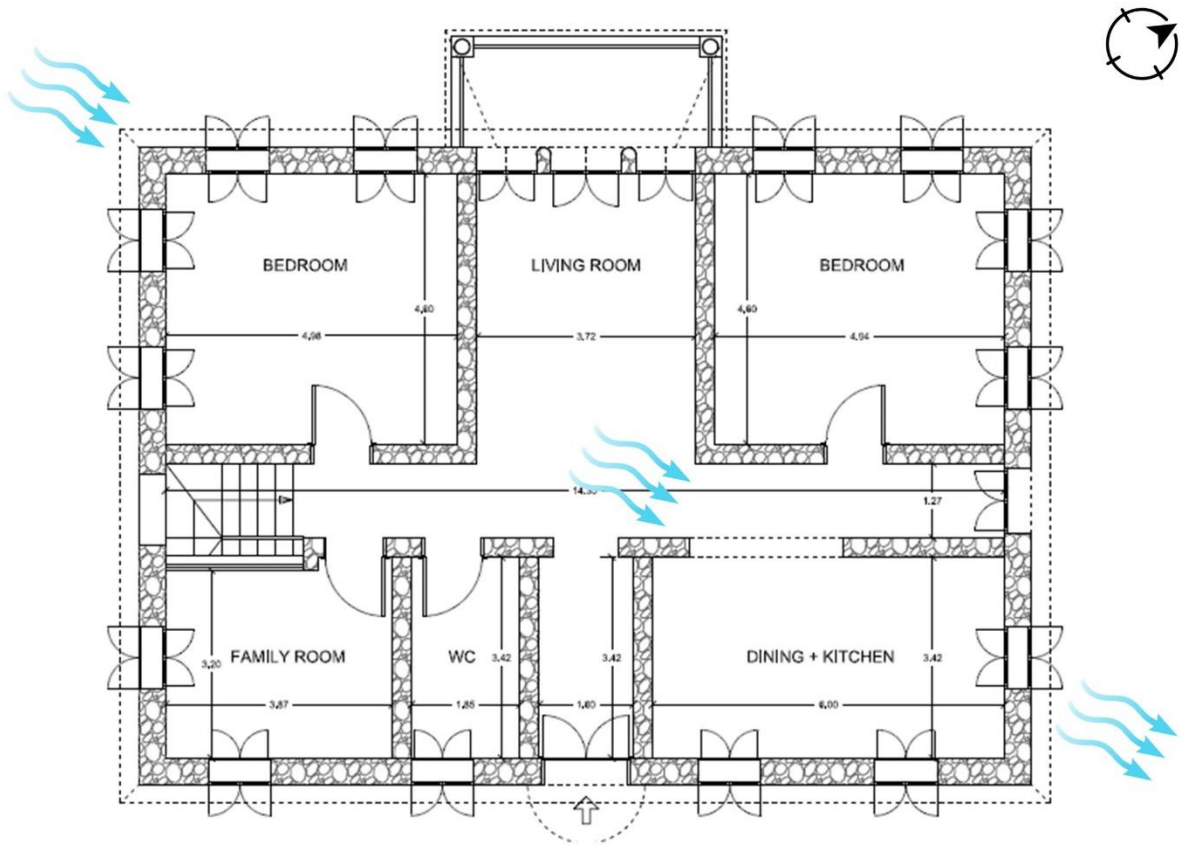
Wind direction and flow on the Ground Floor Plan of the Old house- Ghazir.
